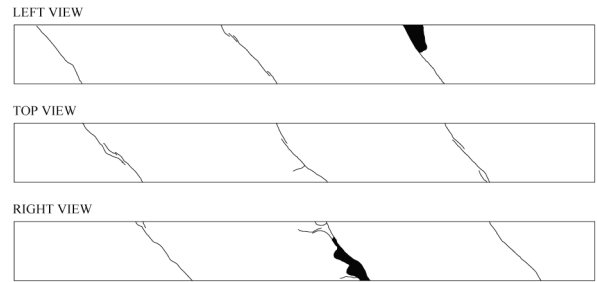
Cracking pattern: Beam E-0.30-1.1-0
